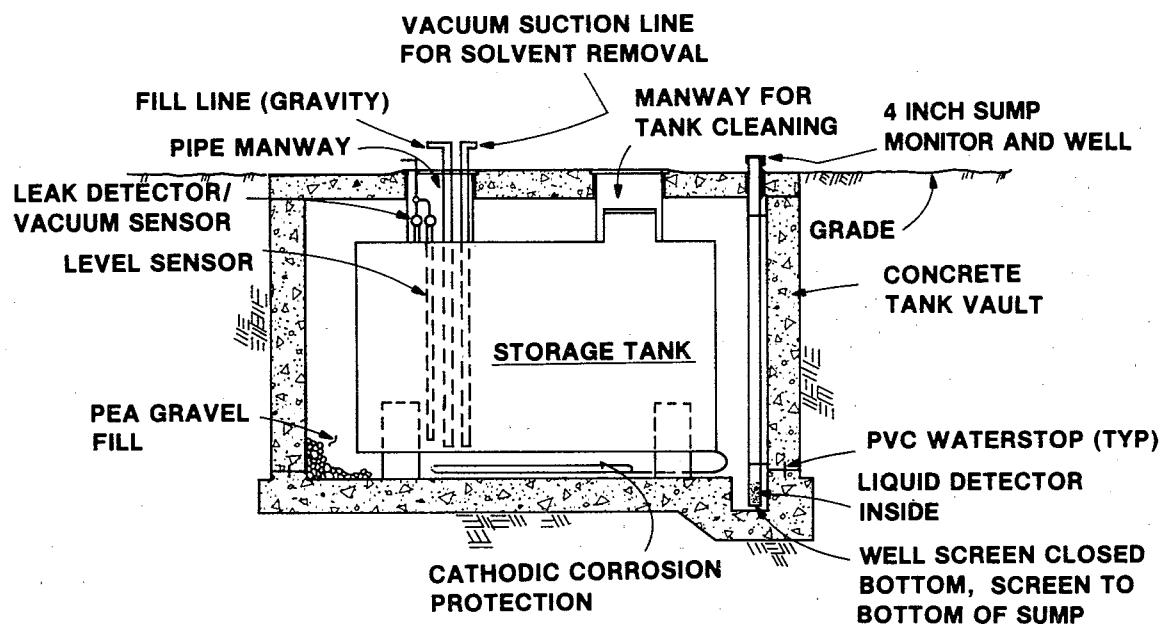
Secondary containment using concrete walls. (Adapted from W.D. Bellamy and R.B. Brummett. Designing for Underground Tanks. Pollution Eng., Nov. 1986, p. 24.)
